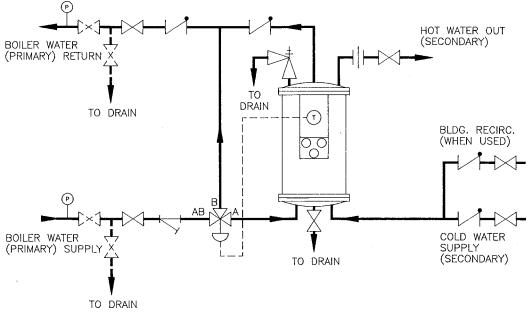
Single Water To Water Heater With 3-Way Diverting Control Valve at Primary Fluid Inlet to Heater
